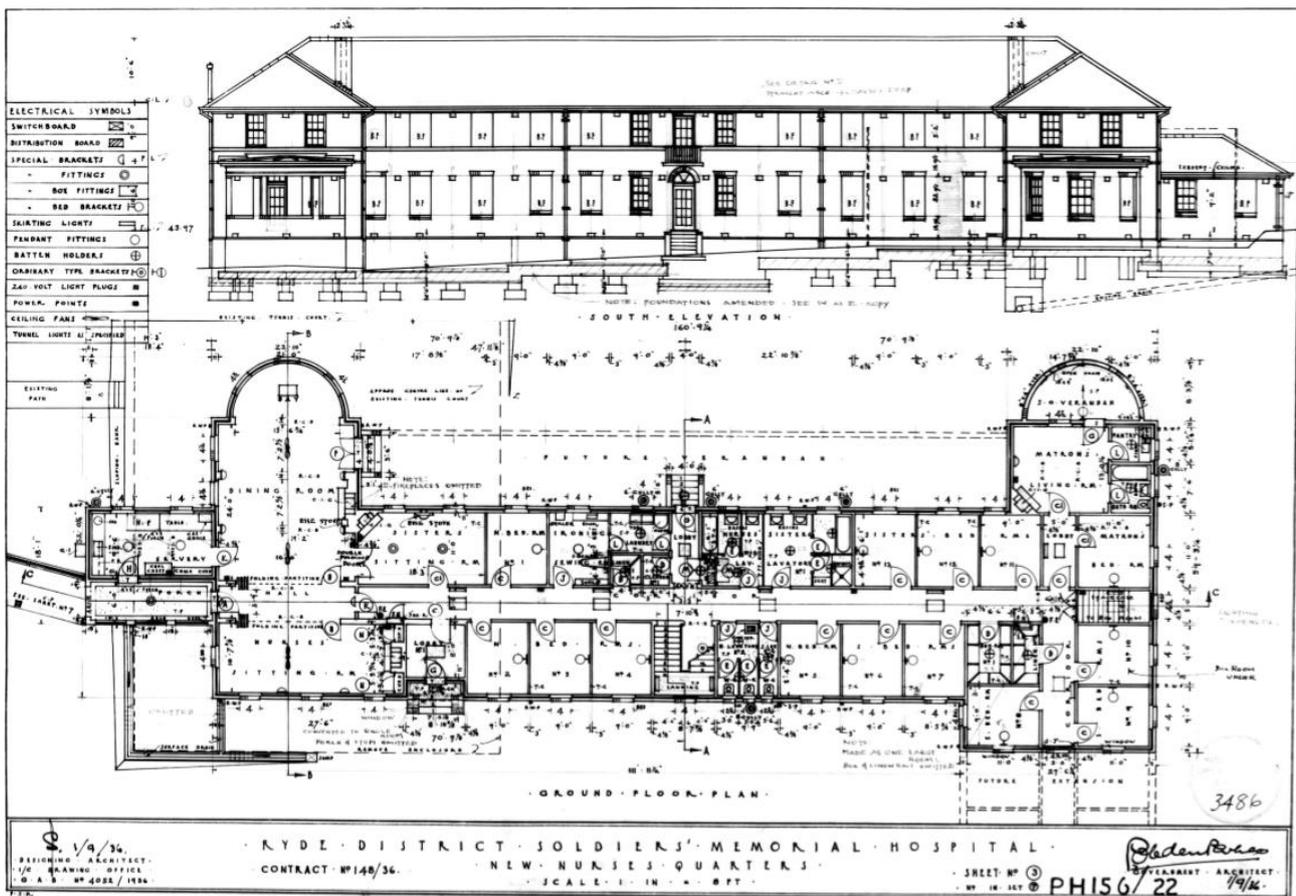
Ground floor plan and principal southern façade of the nurse's home.
